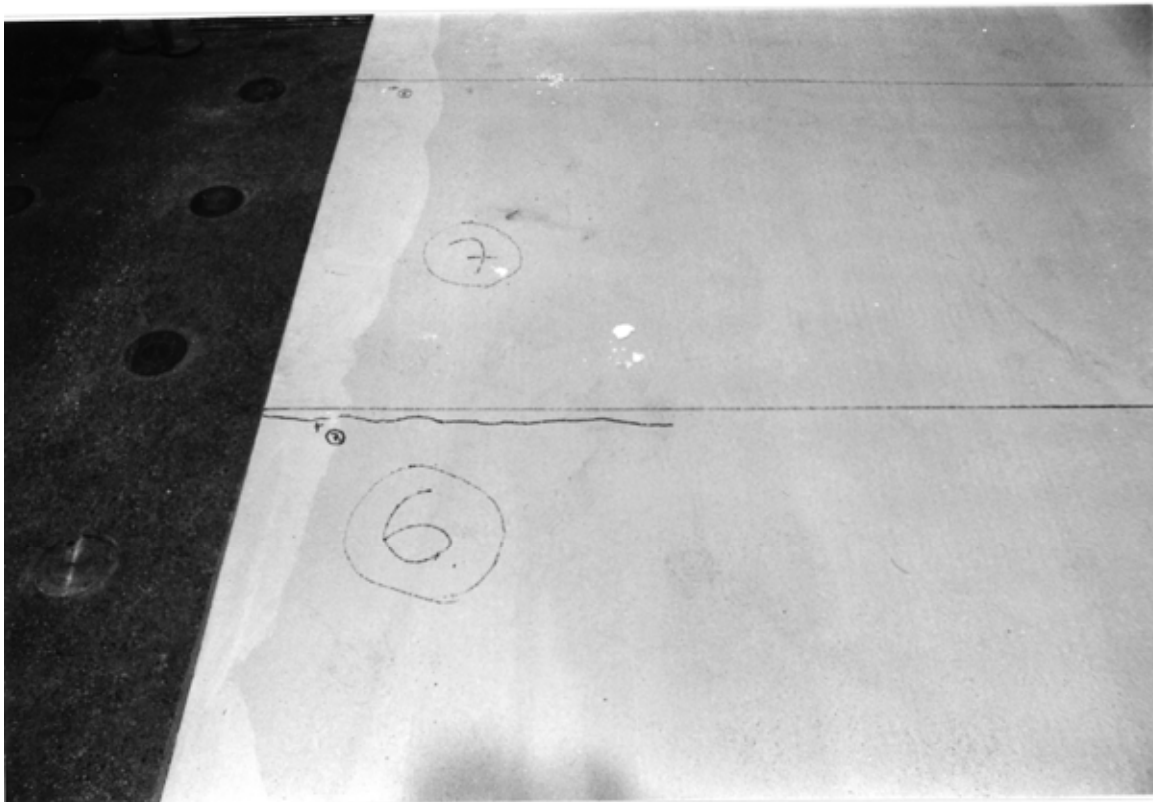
The cracking of the concrete topping and the tie beam between the slab units no 6 and 7.
